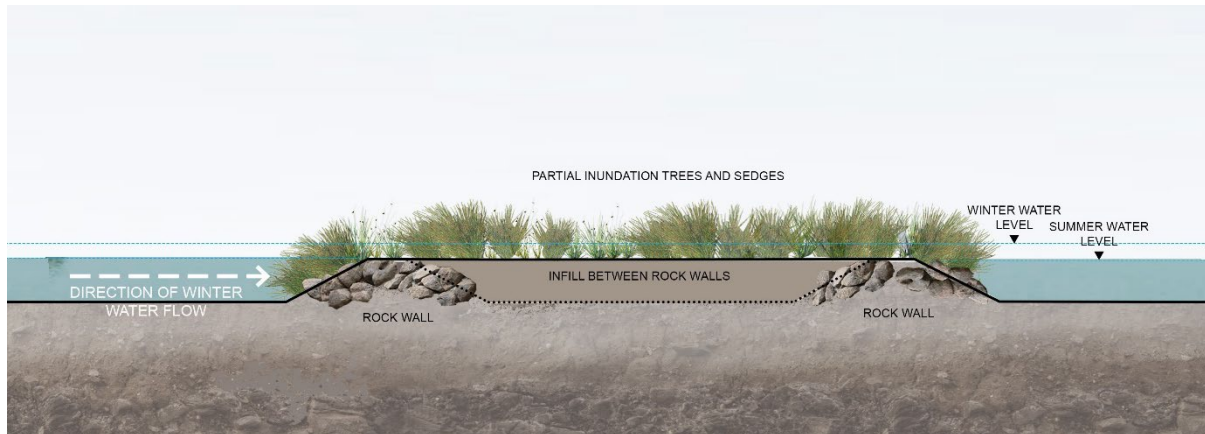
Long-section of a single cross-stream structure showing infill area (between rock walls), dense planting, and average summer and winter water levels. Winter flow passes over the cross-stream structure.
